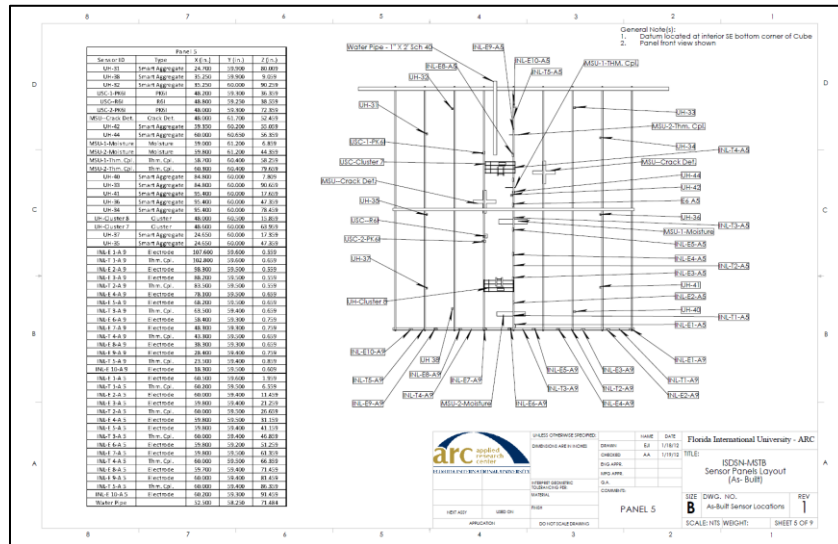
Front view of 3D CAD drawing identifying all sensor locations on Panel #5.
